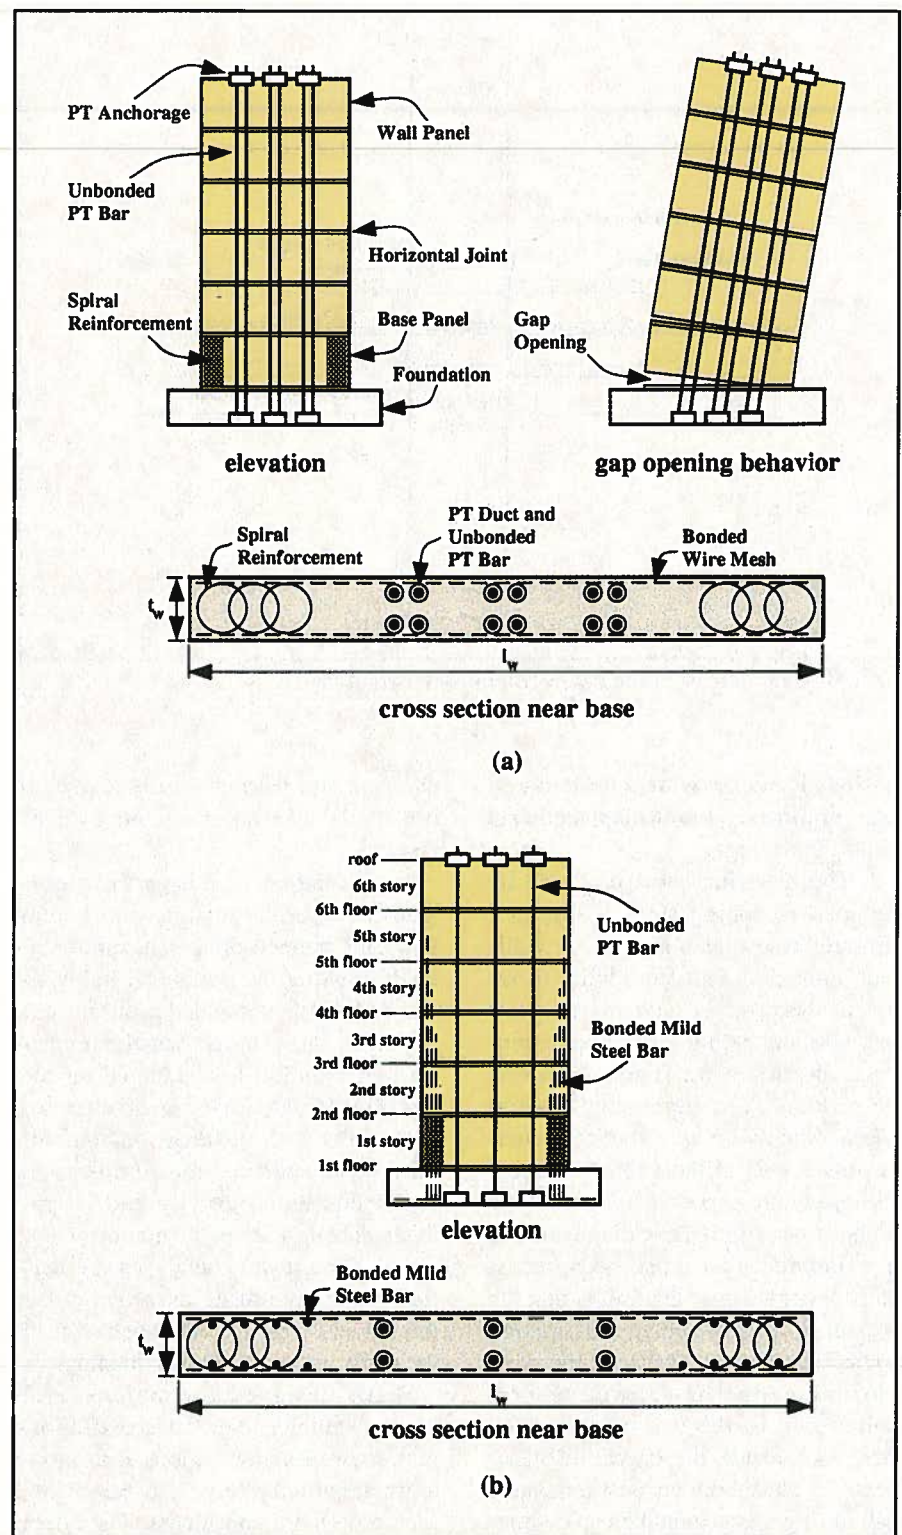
Precast walls: (a) unbonded post-tensioned wall; (b) hybrid wall.
